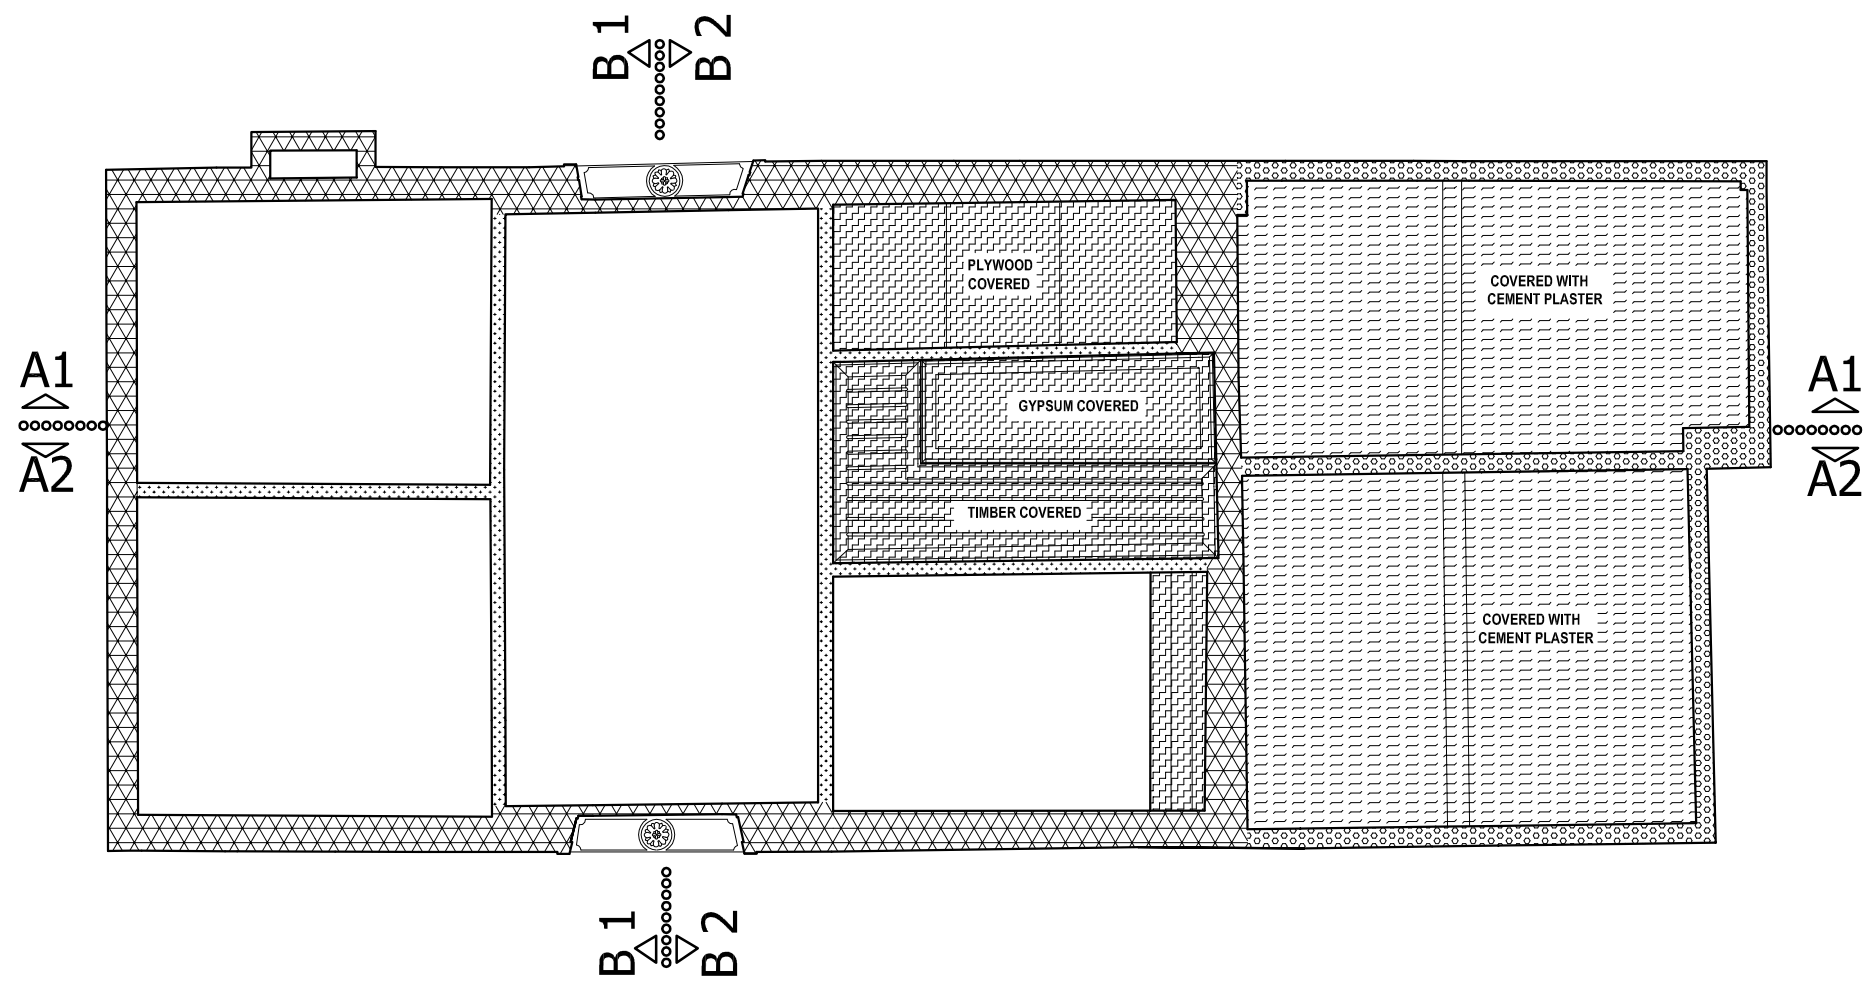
Analysis of Structural Characteristics- Mezzanine Floor Plan
